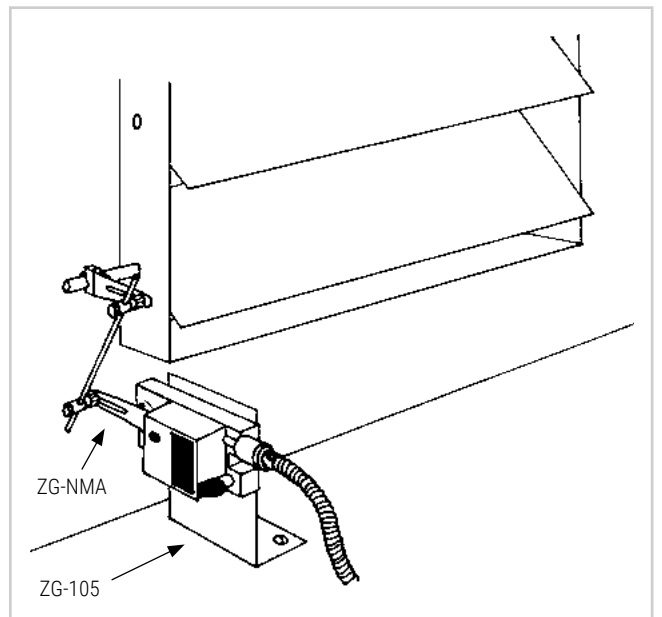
Actuator is mounted on the ZG-101 universal mounting bracket or field fabricated plate with crank arm, ball joints, and push rod for connecting the actuator to the damper louvers
